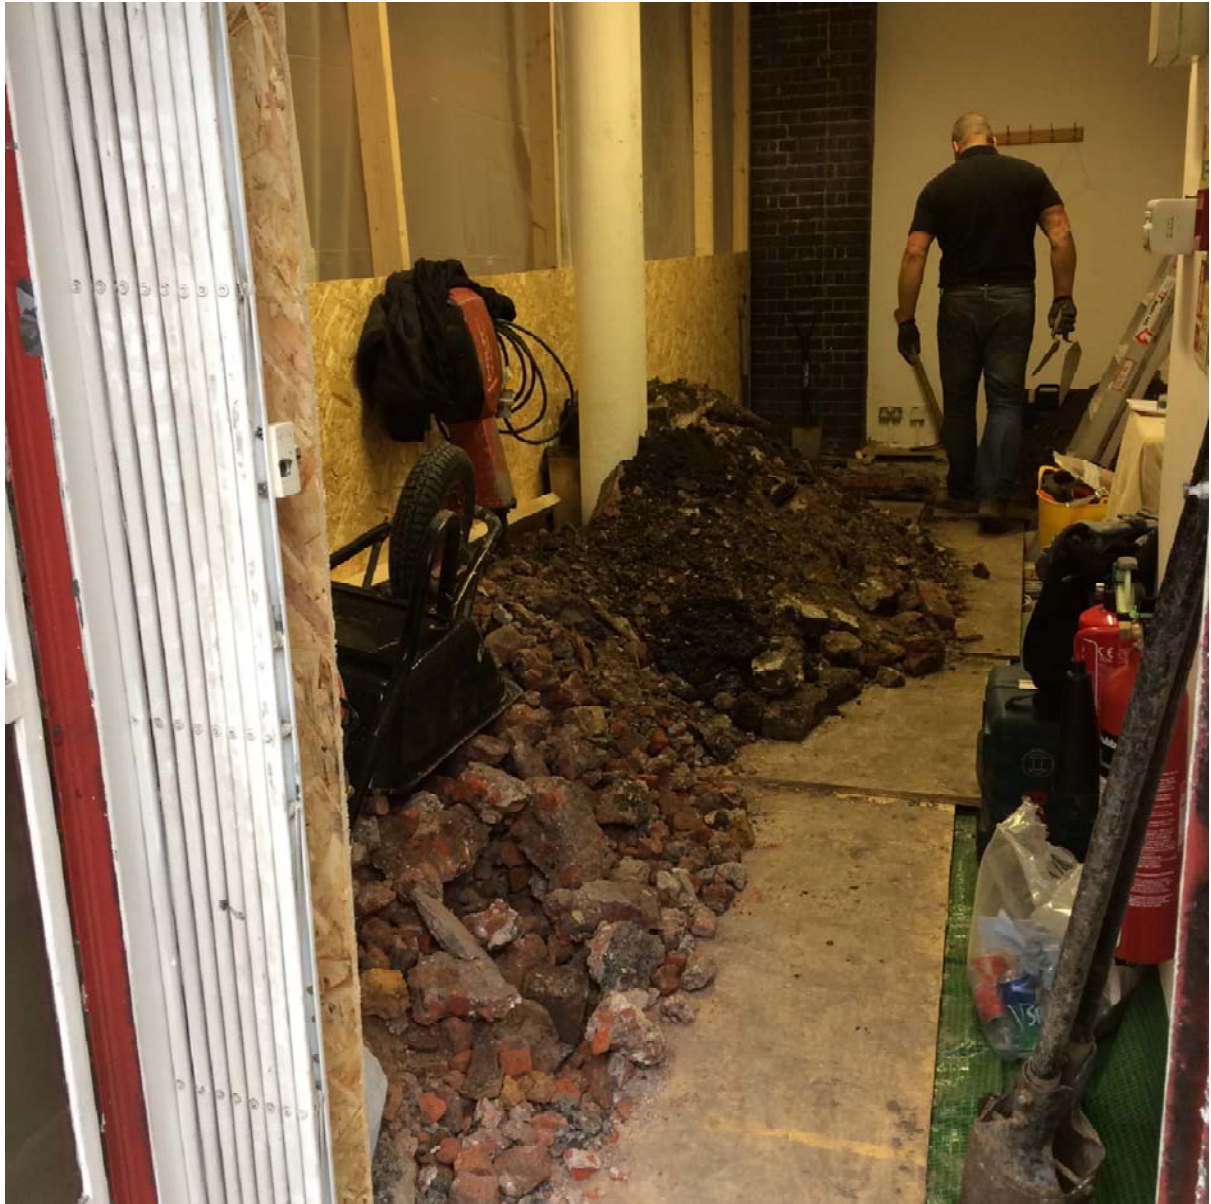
View of TP1 & 3 looking north showing modern concrete foundation to the north
